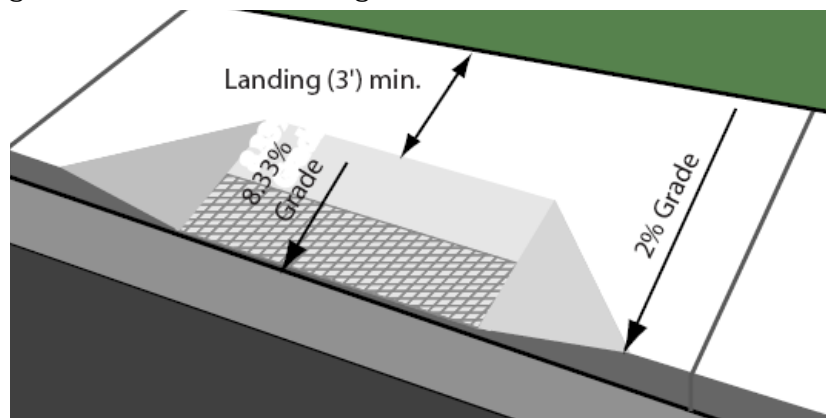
Curb Ramp and Sidewalk Landing Specifications
